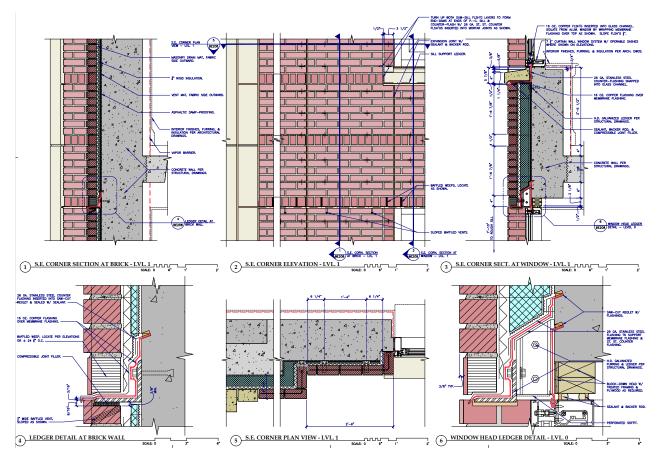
Typical Brick Walls @ Furred & Un-Furred Ledgers
